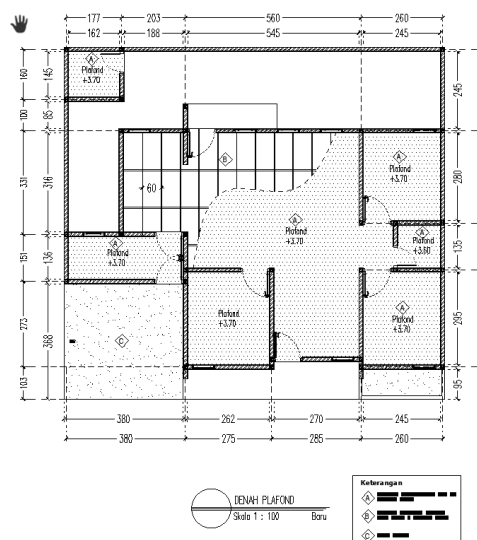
Ceiling Cover Plan of Official Residence, Jl. Mojoklanggru Lor
